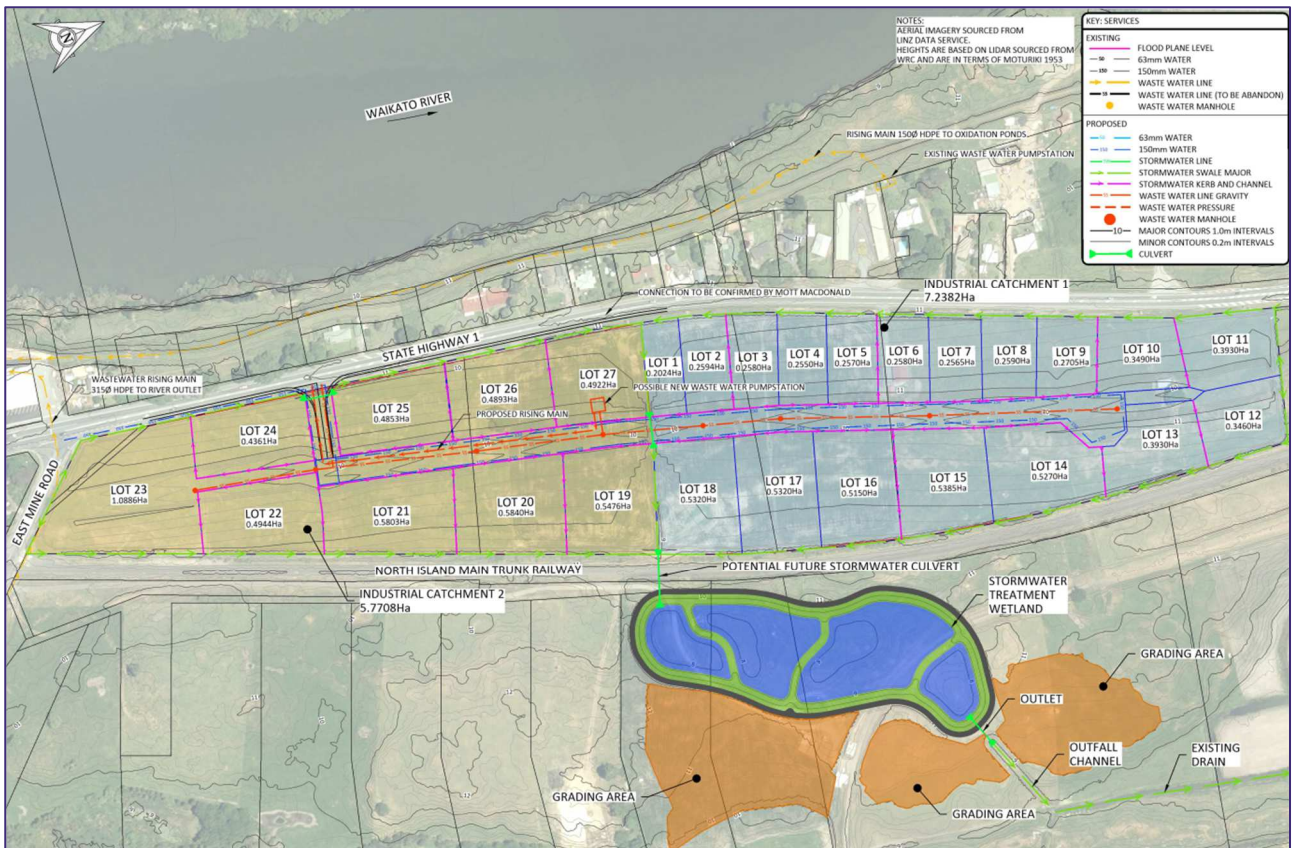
Proposed stormwater management layout for the development of Area 1. Abstract from drawing 144370-02-0704.
